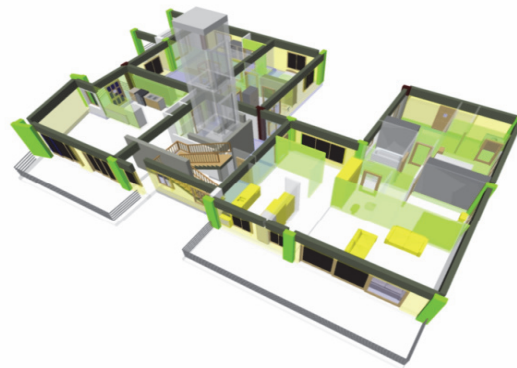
BIM/ABV integration – 3D rendering of building floor showing floor’s damage state (darker colors indicate greater damage) [23]
